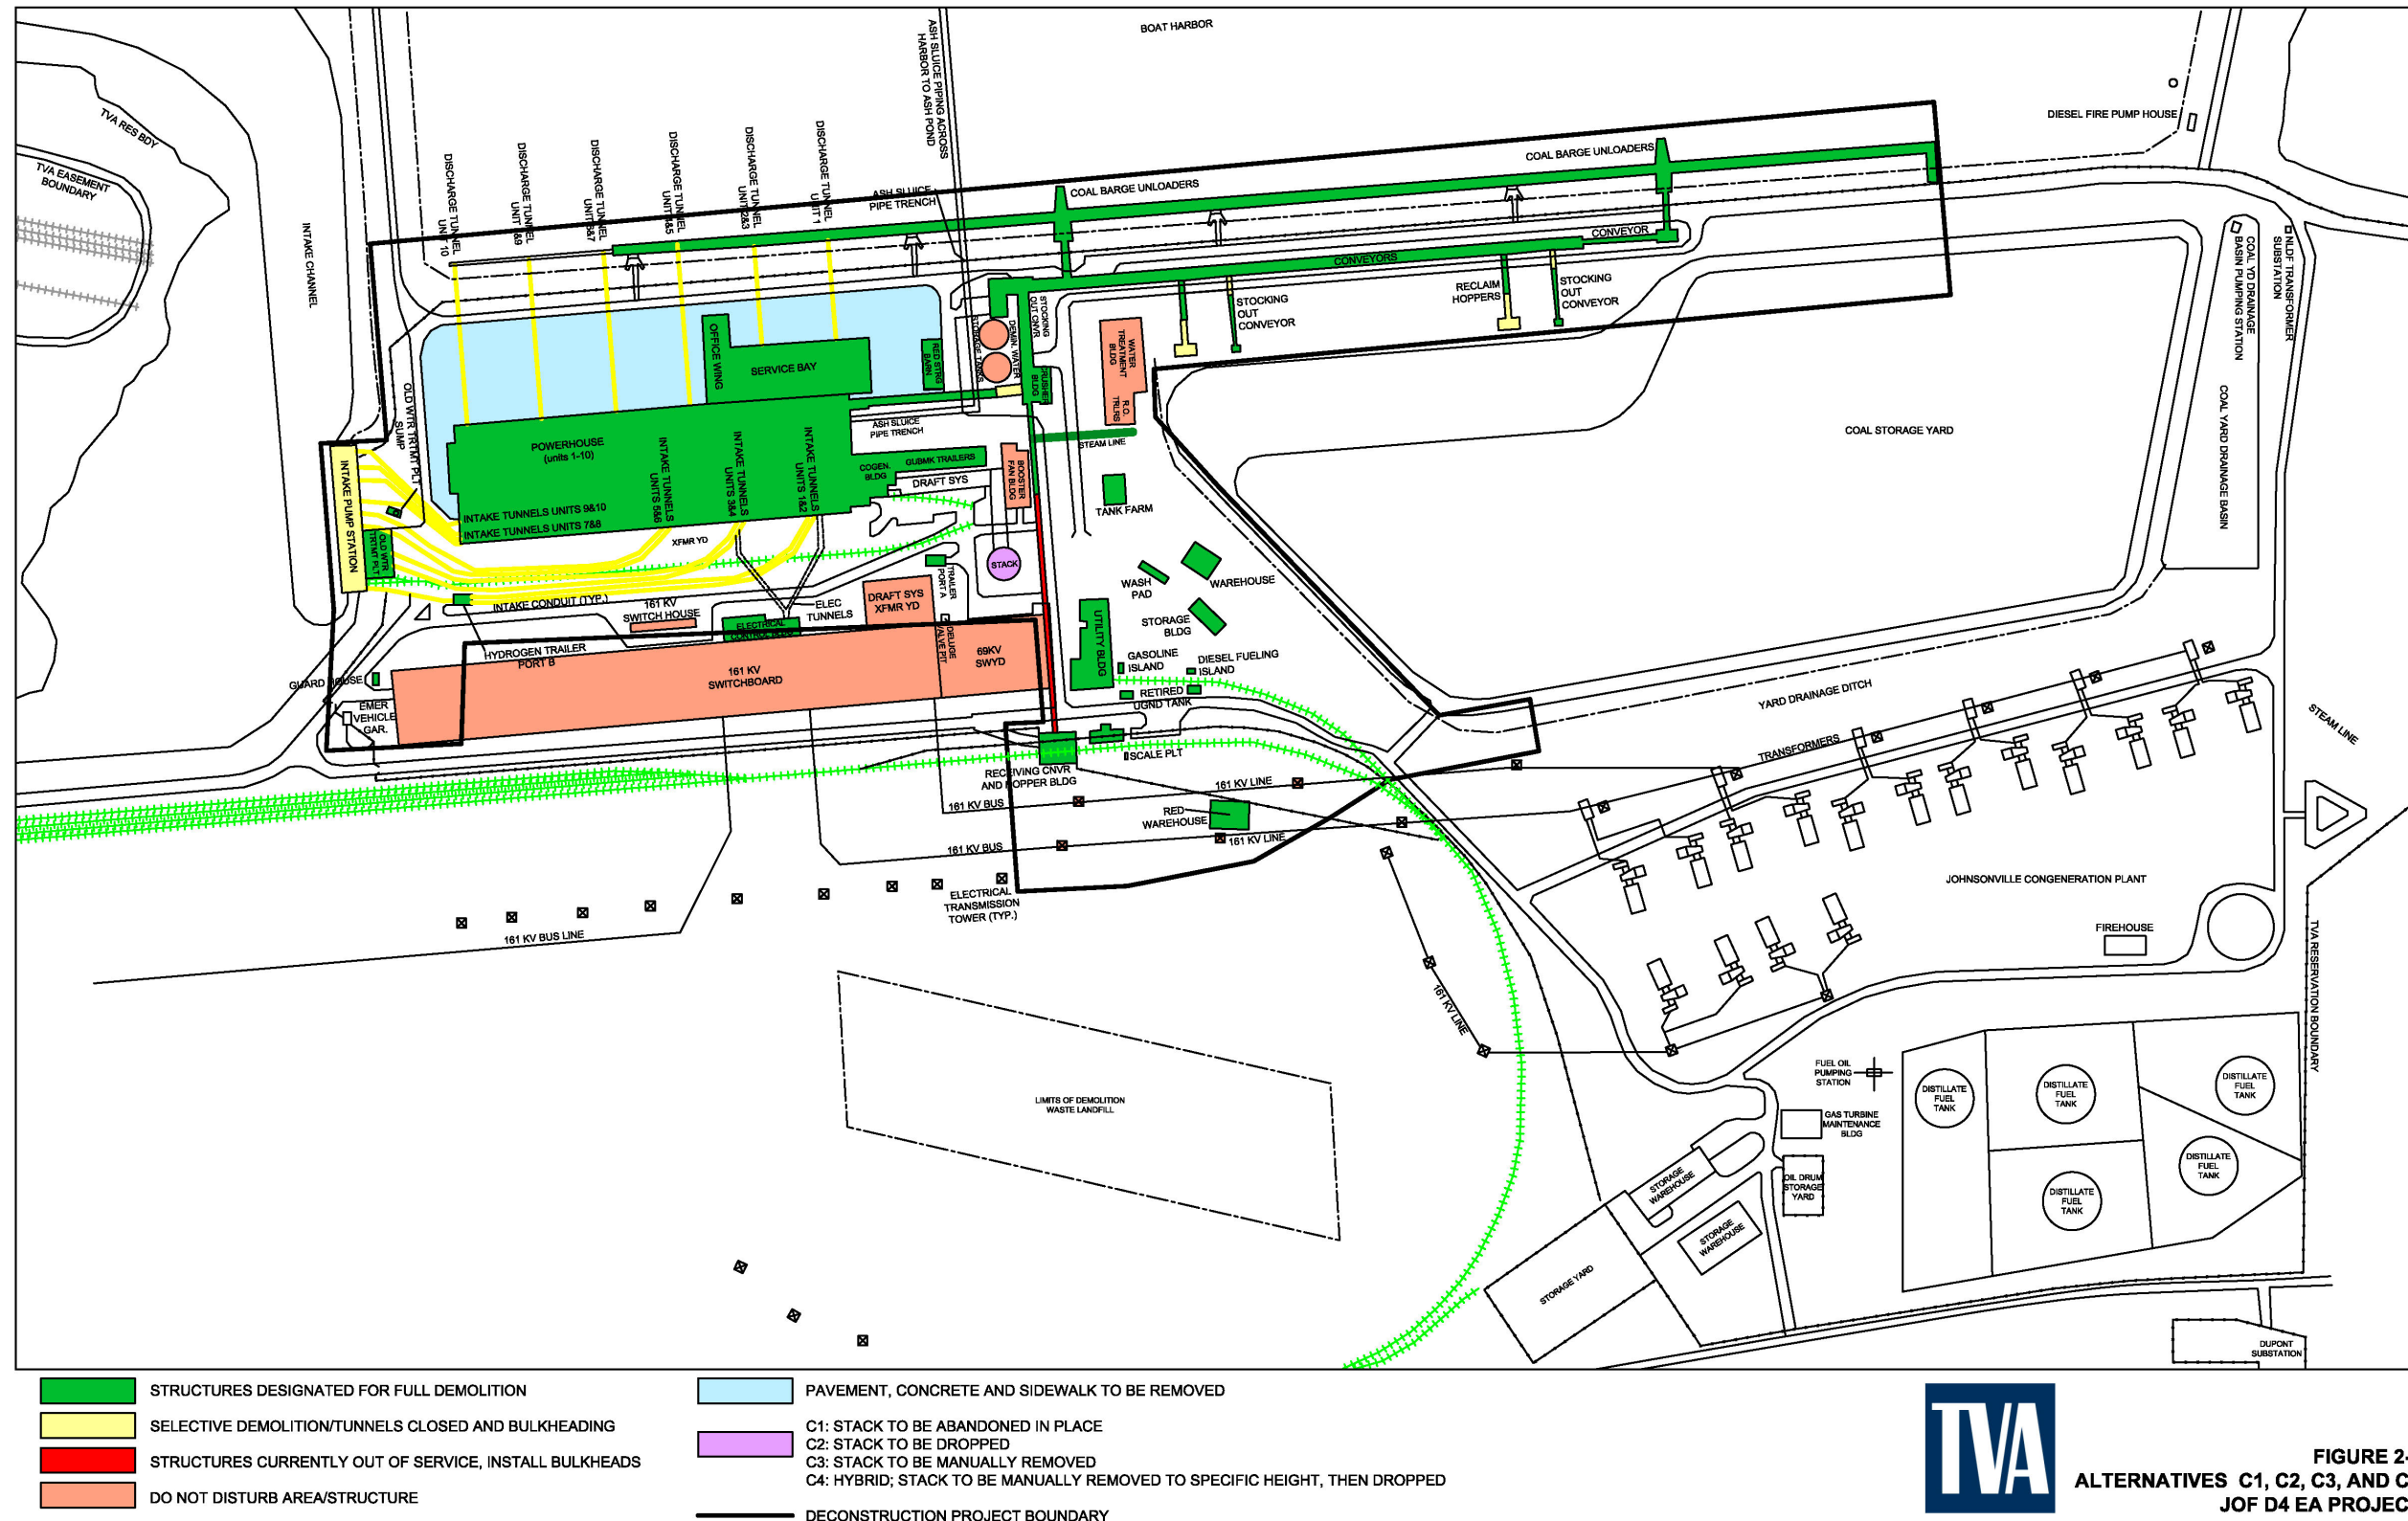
JOF Alternatives C1, C2, C3, and C4
